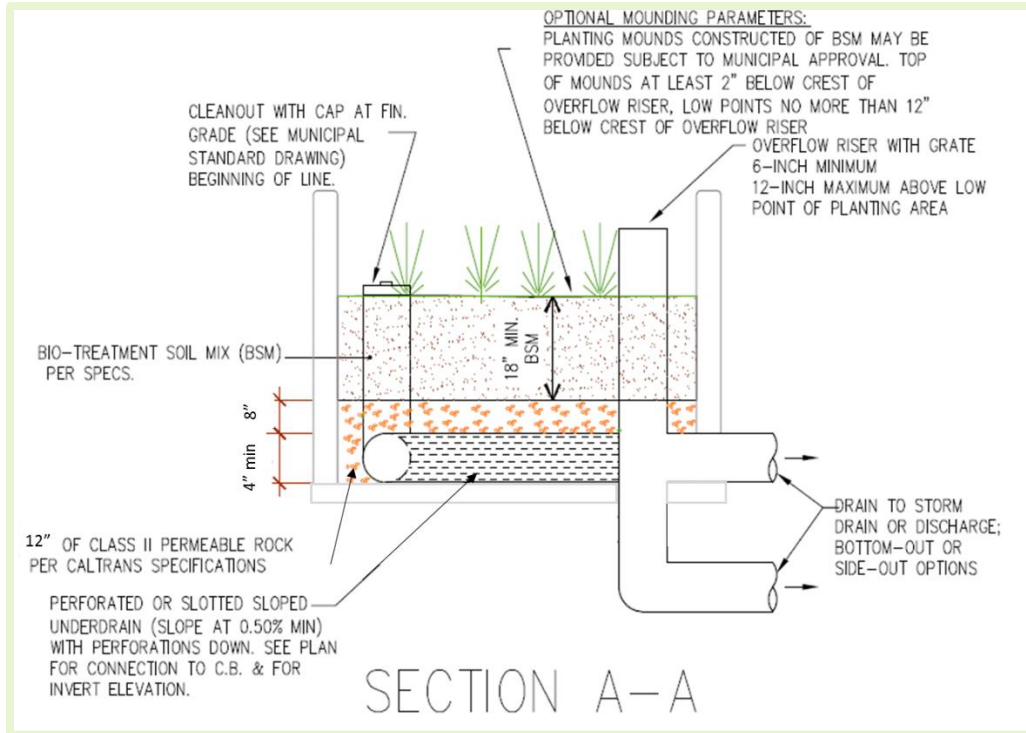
Cross section A-A of flow-through planter, shows side view of underdrain (Not to Scale)
